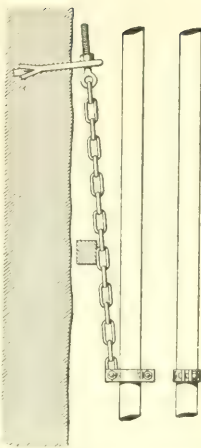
METHODS OF SUPPORTING PUMP COLUMN IN DEEP LEVEL SHAFTS.
